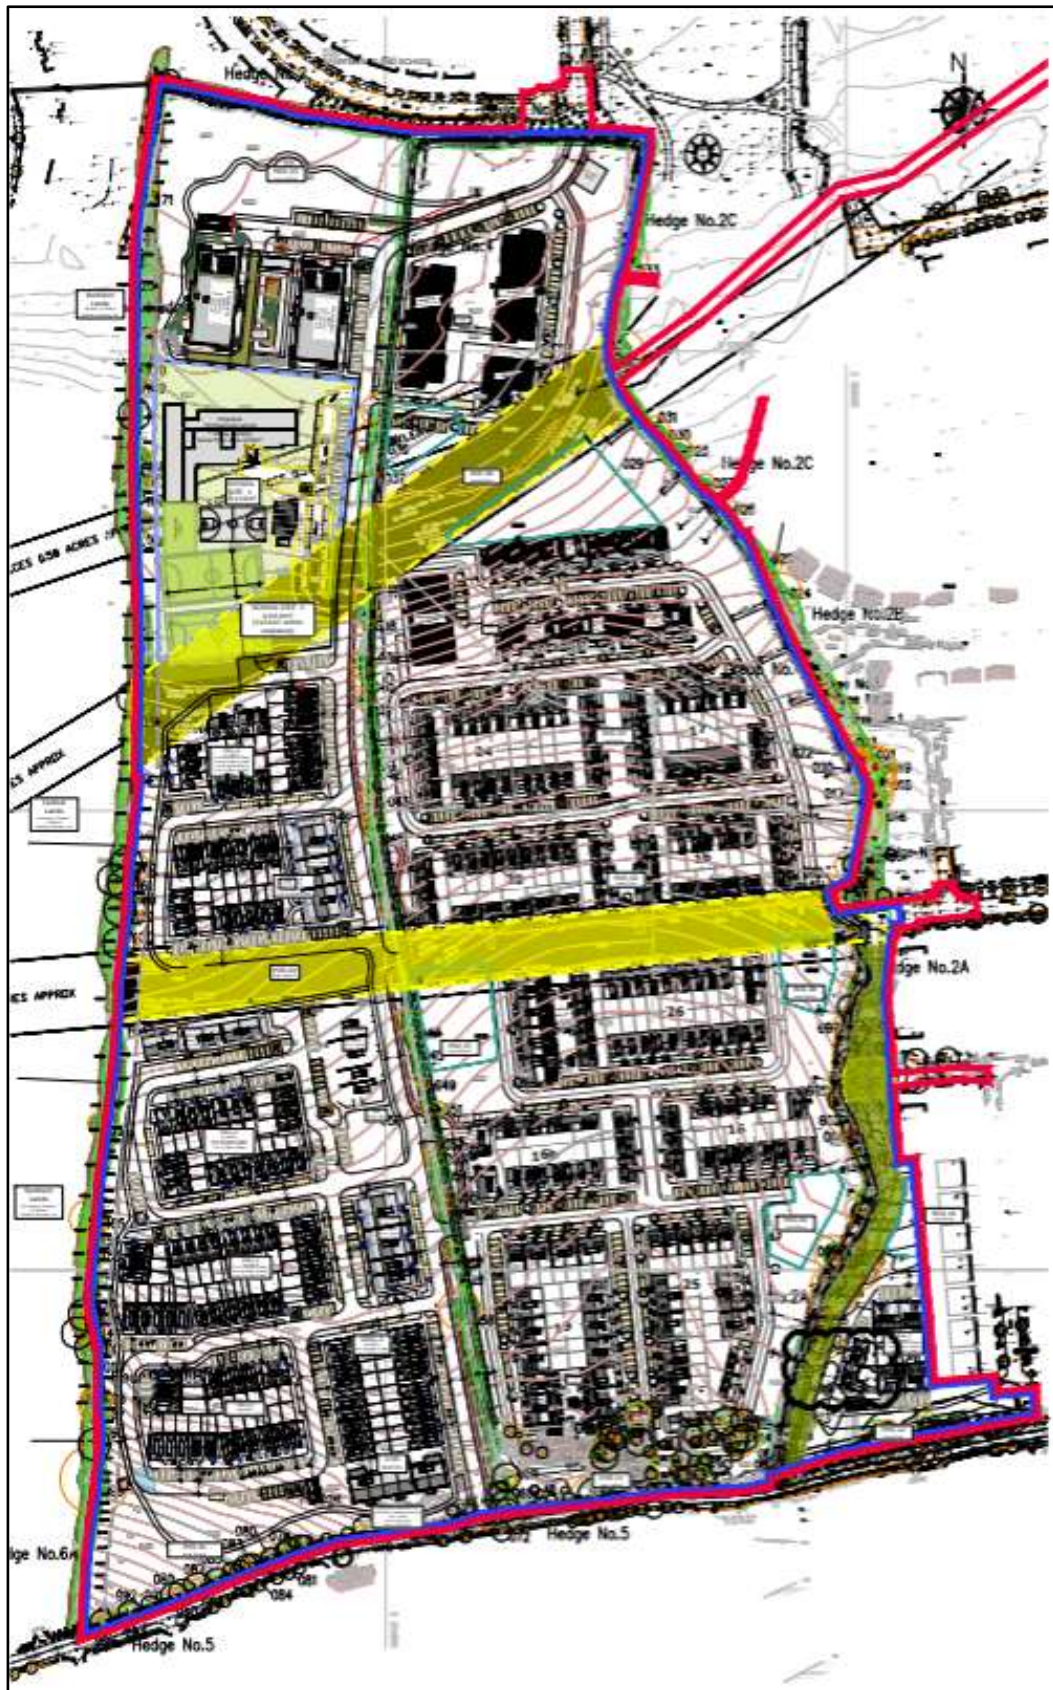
Proposed Development Site Layout (MCORM, 2025)
